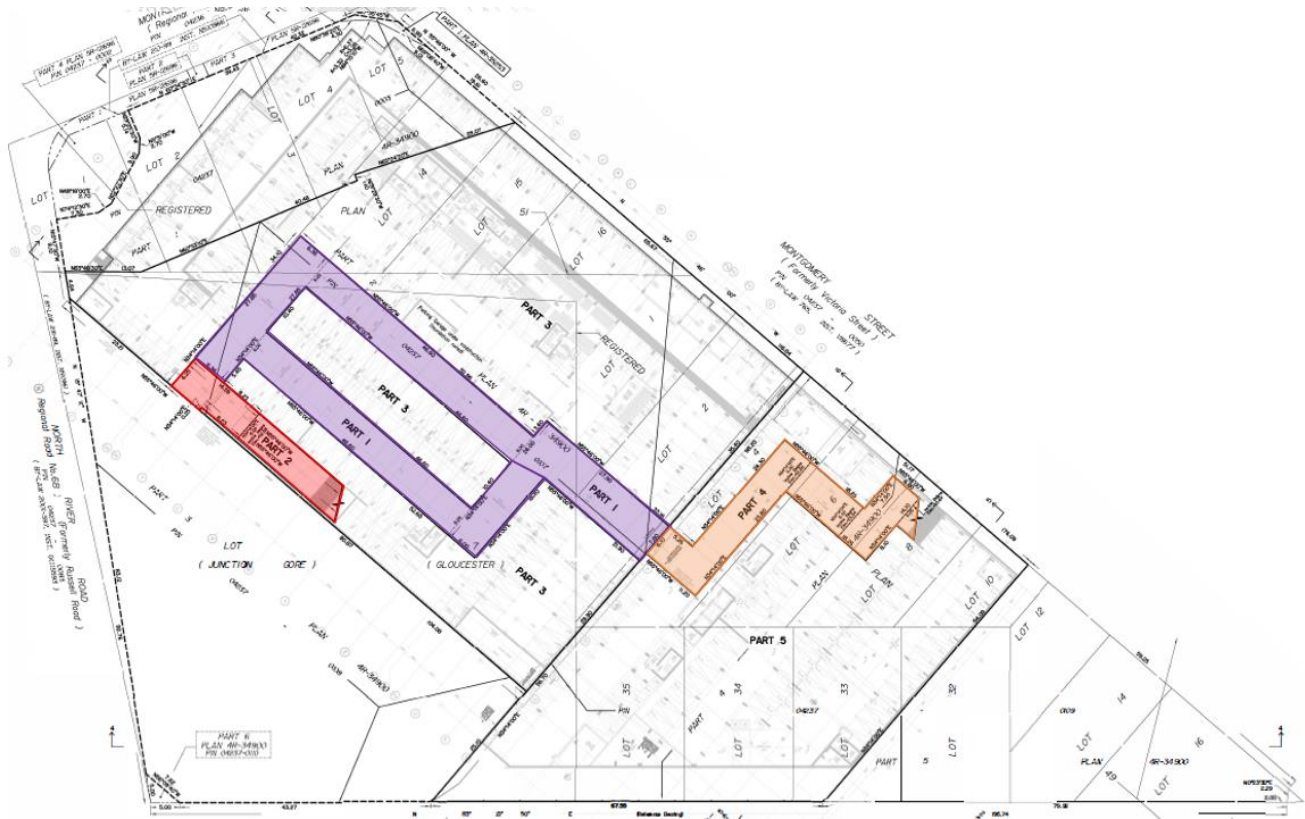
Draft-R Plan, Parking Level P1 (Elevation 53.75)
